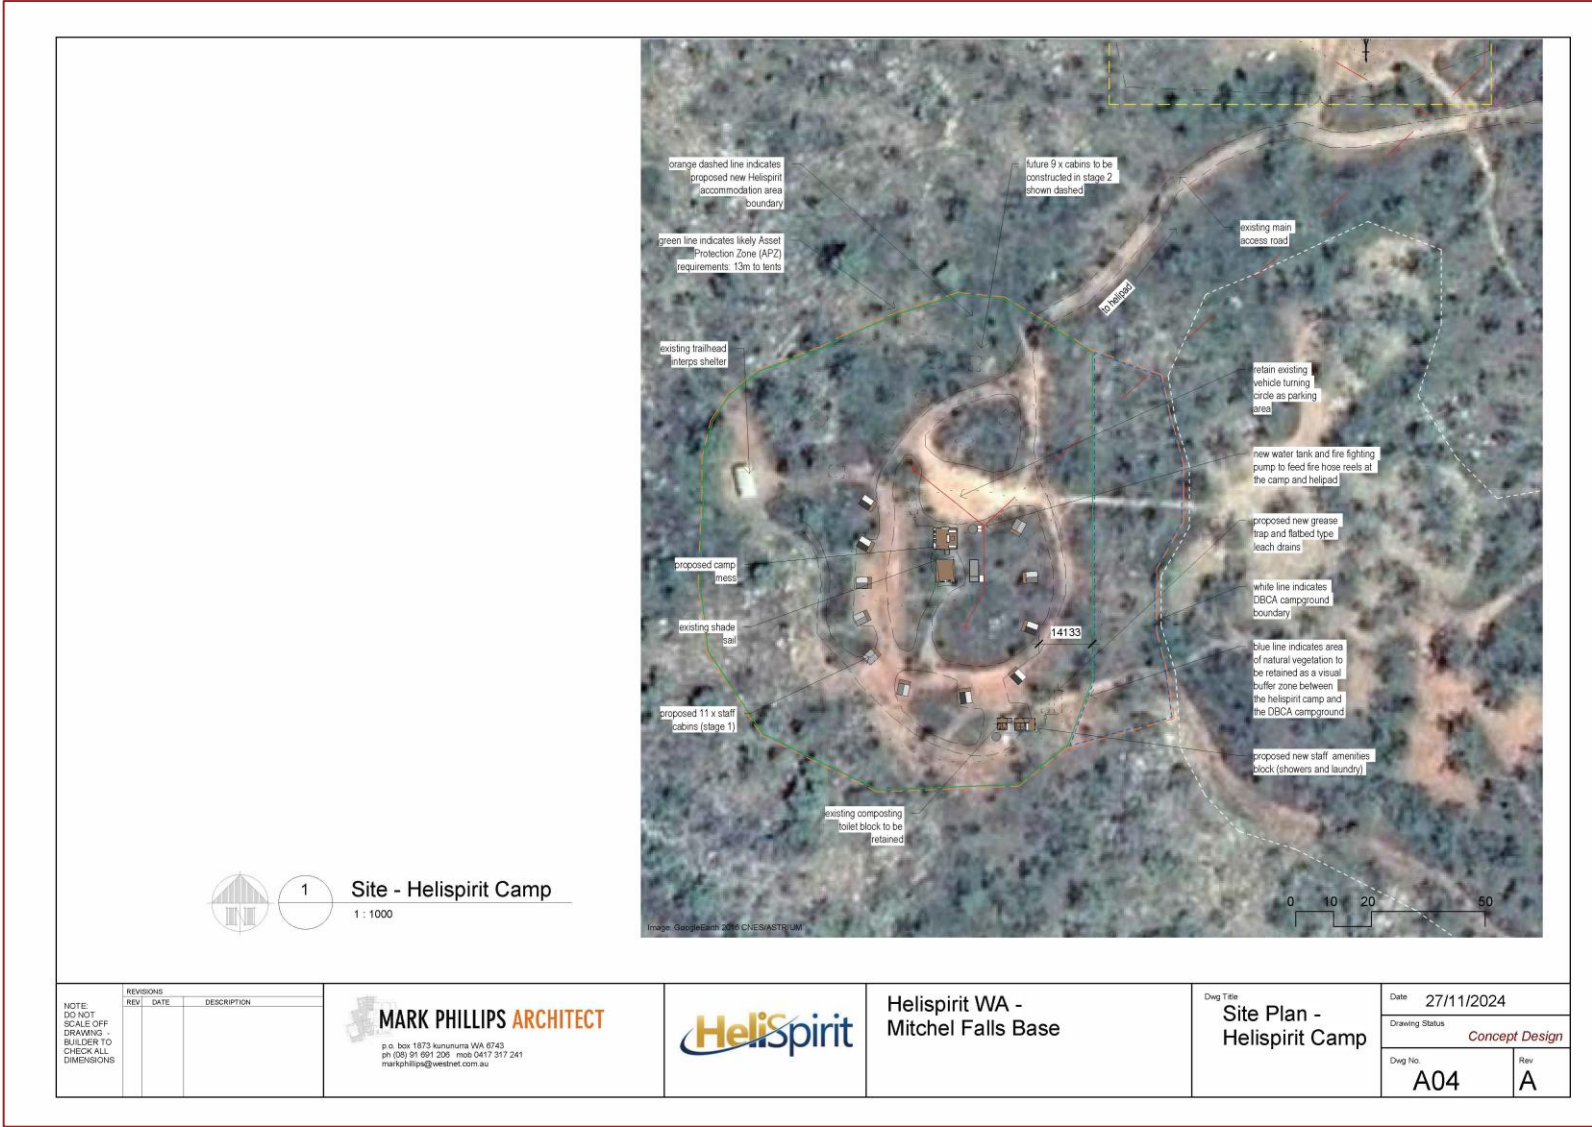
Proposed New Site Plan for Mitchell Falls Helibase Staff Camp
